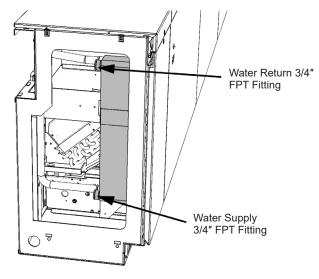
Typical Piping Through The Floor, Inside Cabinet (Unit Size 024 Shown)
